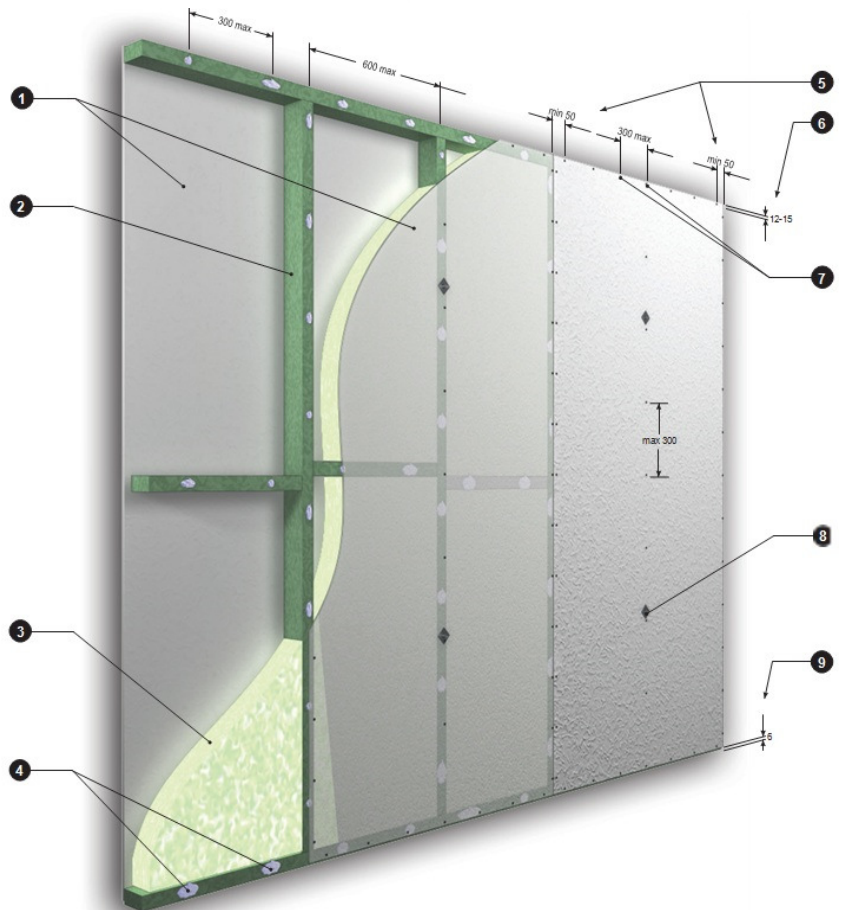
Timber Fire Wall Installation Detail (Vertical)
